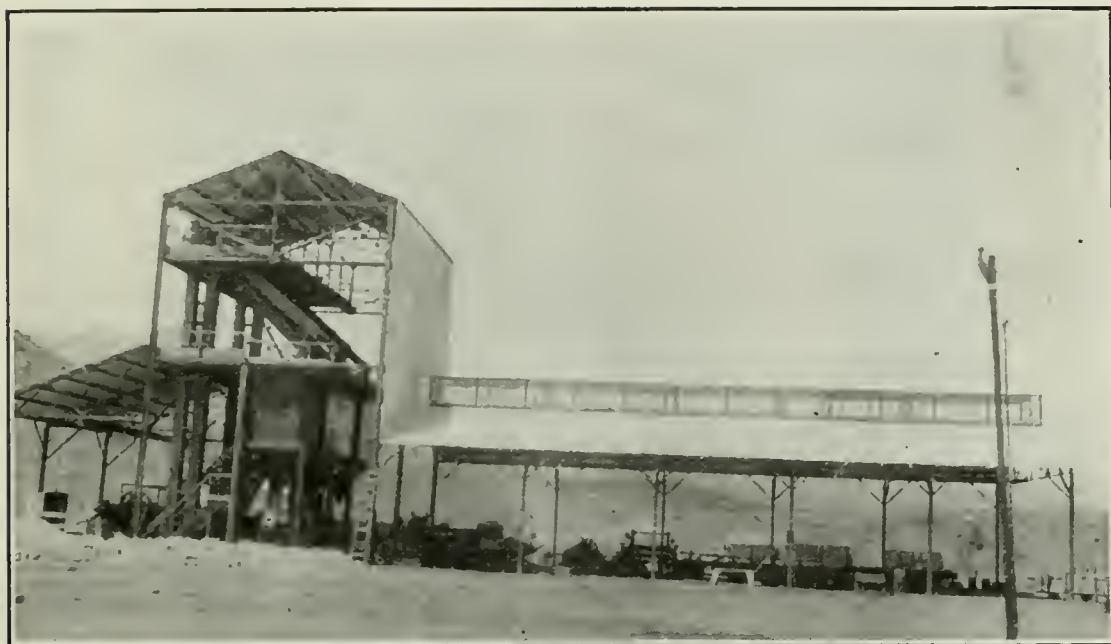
Los Angeles Brick Company, Alberhill plant, during construction. Riverside County.
